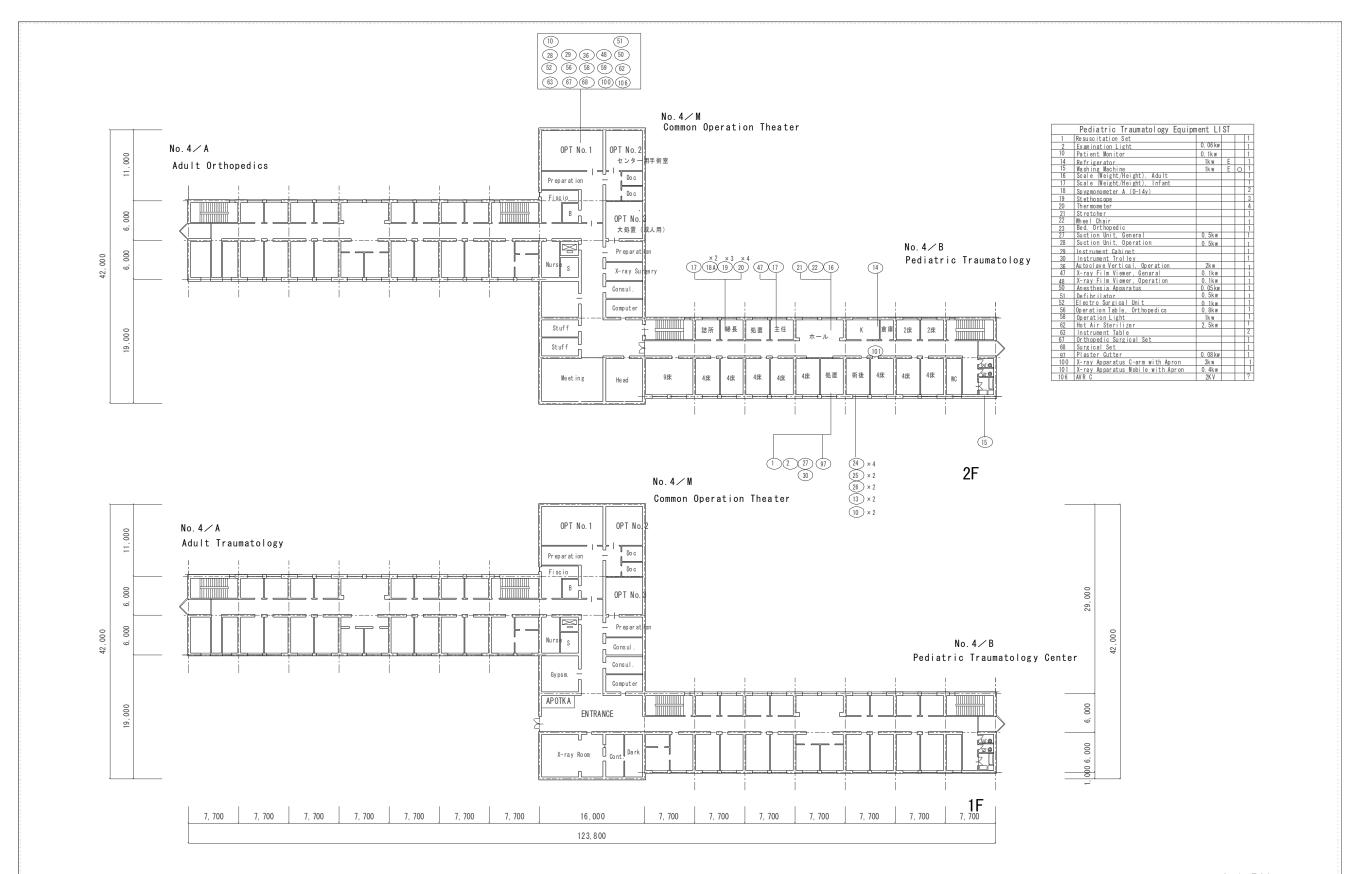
No. 4 1 F • 2 F PLAN S=1:500
